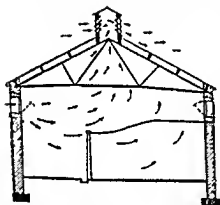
Showing the method of ventilating a stable with hopper inlet windows and a louver board outlet fitted on the roof ridge.
